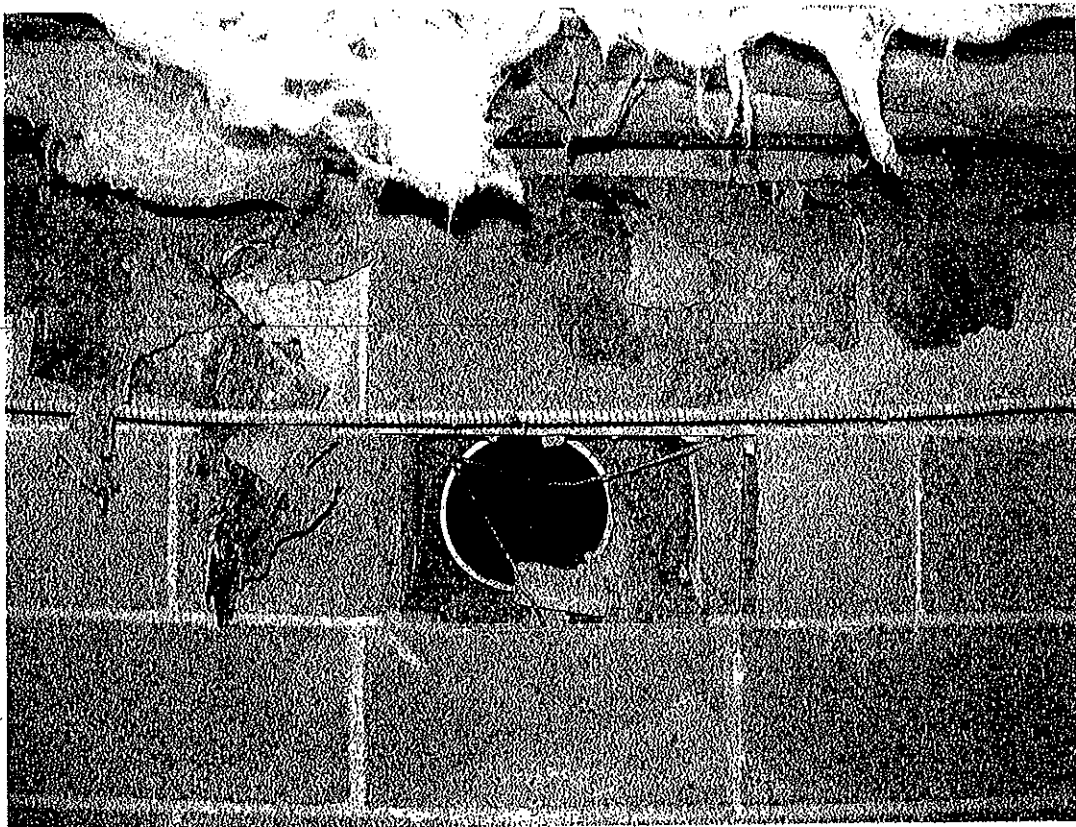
Foundation Vent Pipe through Exterior Wall of Wild Goose Lodge
